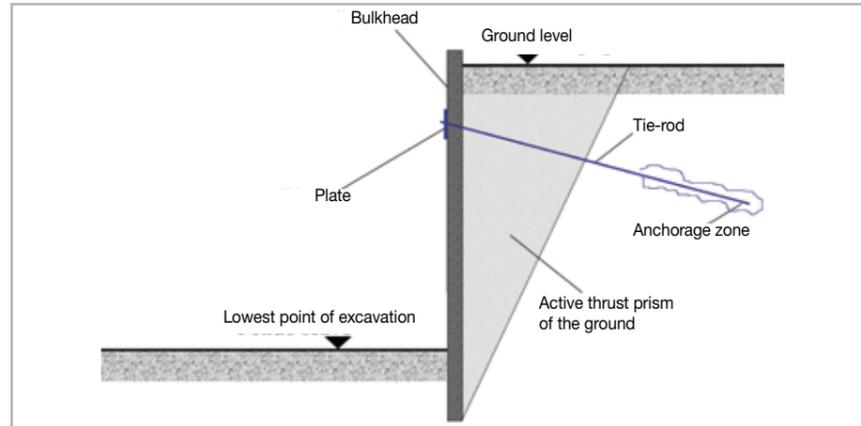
Anchorage points for stays inserted out of the ground's active thrust zone
